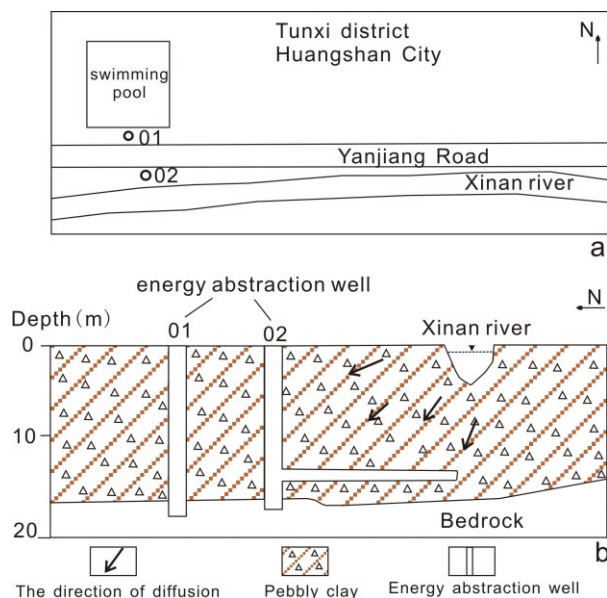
Layout of riverside pumping project (a: ichnography; b: section plan)
